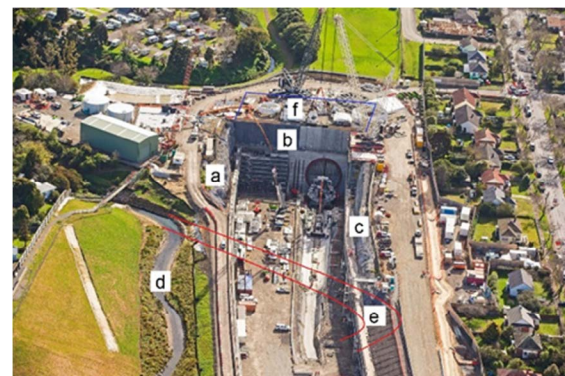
North aerial view of SAT on 7 August 2013. a) Western retaining wall RW909, b) Portal headwall RW910, c) Eastern retaining wall RW911, d) Diverted Oakley Creek, e) Original position of Oakley Creek f) Extent of stabilised block and MSE wall and crane loading platform
